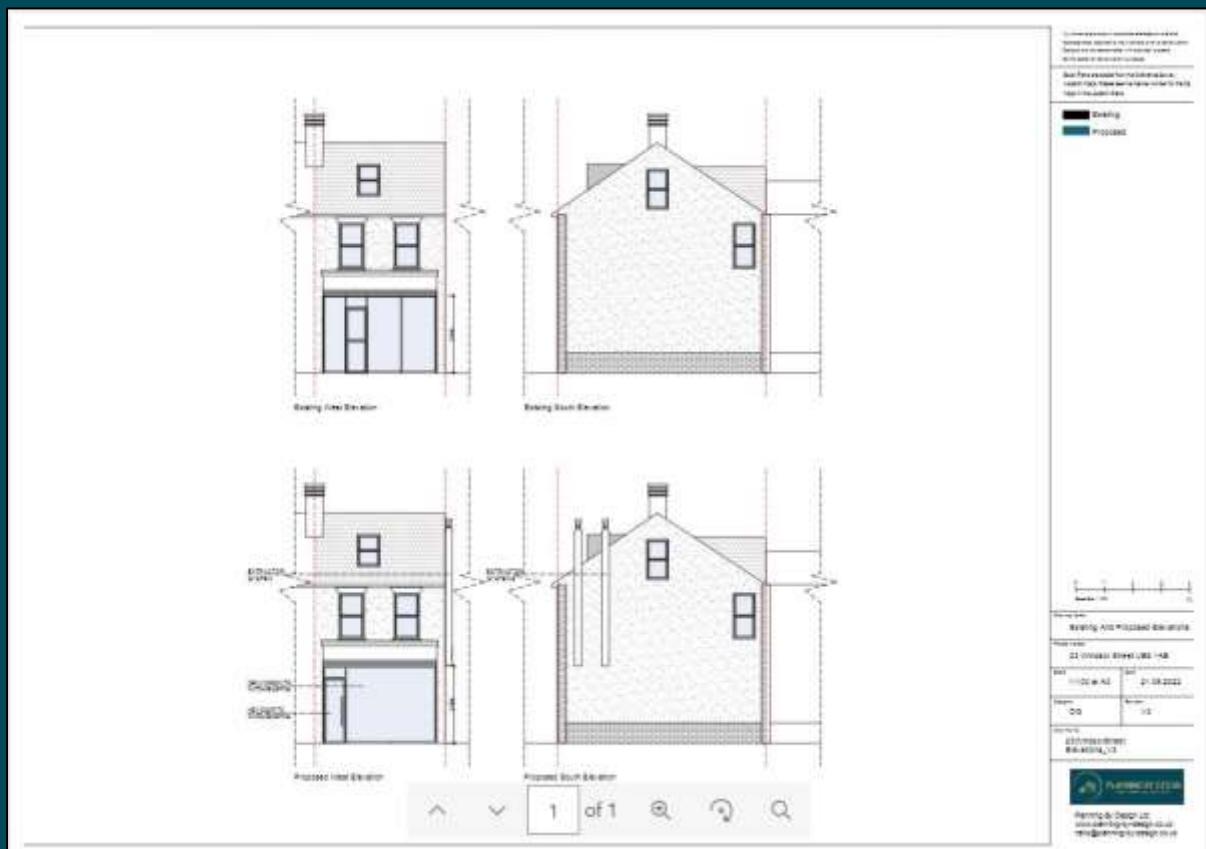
Existing and proposed elevations (not to scale, see planning drawings)
